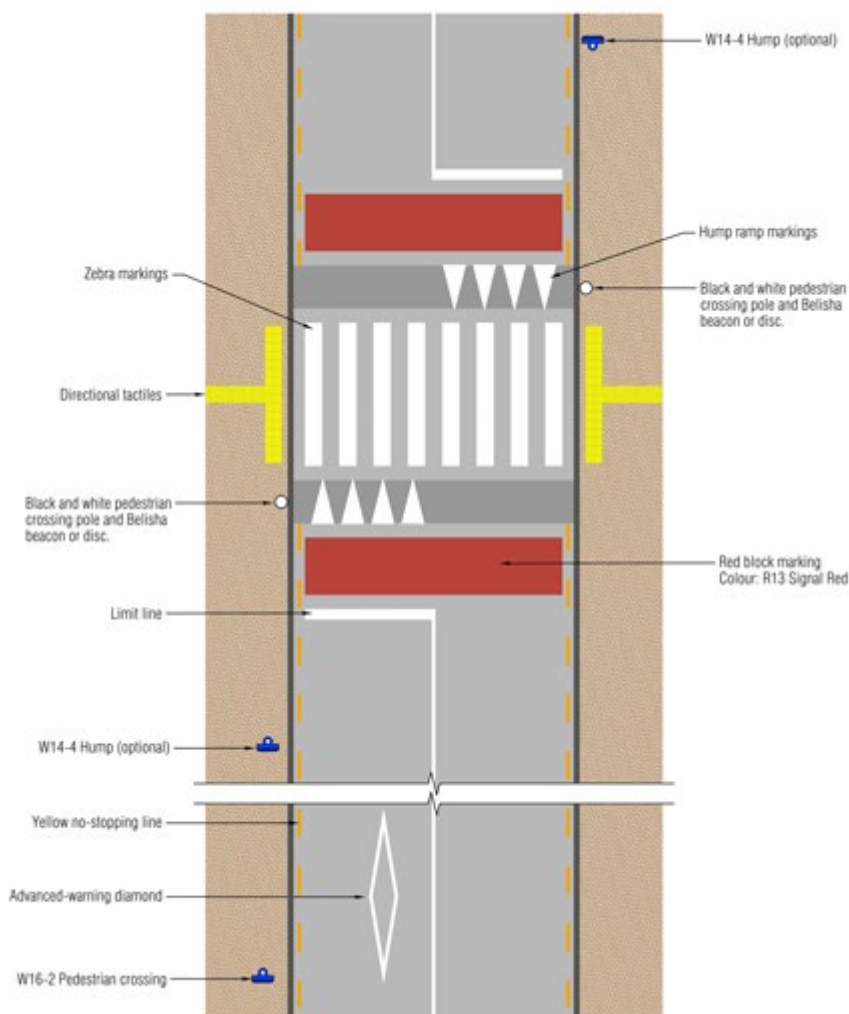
Typical layout for raised zebra crossing with red surfacing treatment
